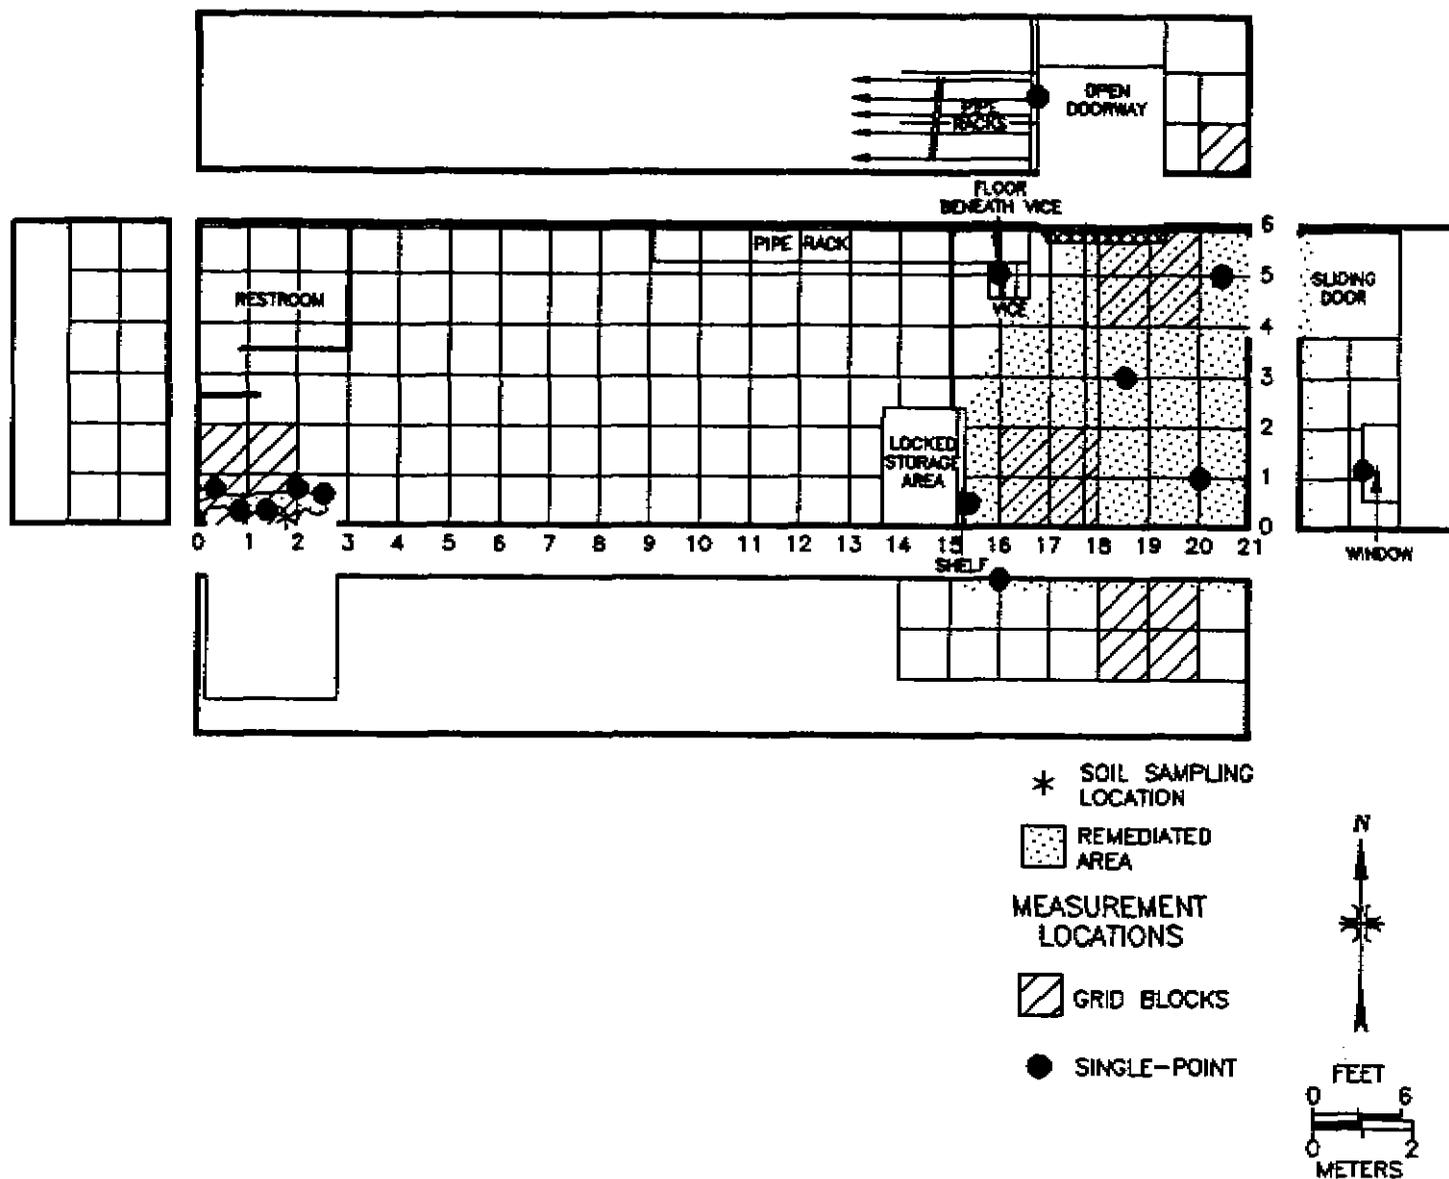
Building 5, Plumbing Shop, Indicating Measurement and Sampling Locations on Floor and Lower Walls
